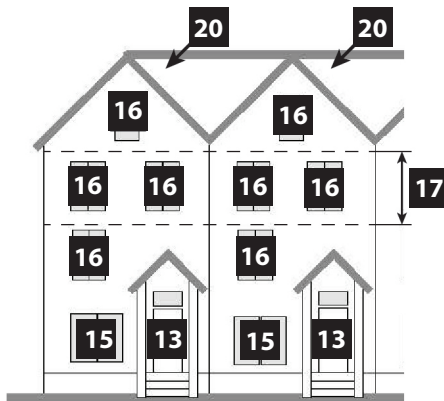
Row building street facade diagram shown with porch entry type and pitched roof type. Not to scale.
